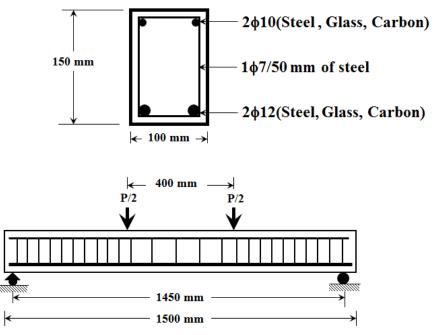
Concrete dimensions and reinforcement details of tested beams
